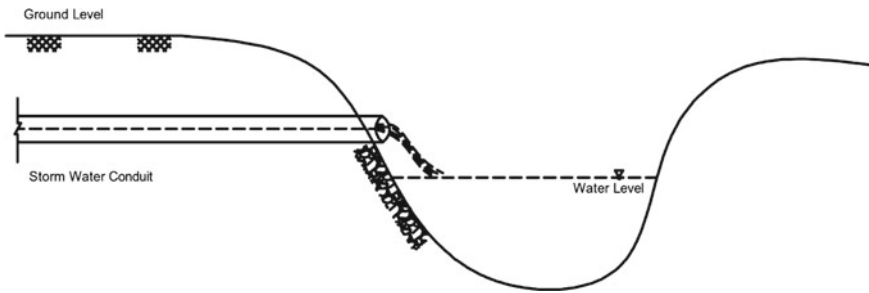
Stormwater conduit outfall. *Source* Manual on Stormwater Drainage Systems, CPHEEO, August, 2019
